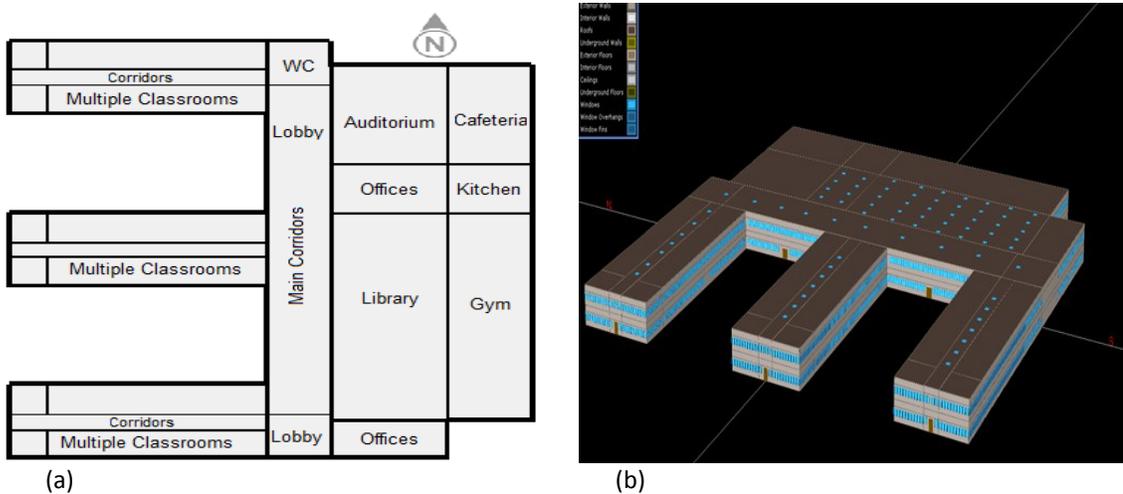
(a) Prototype model floor plan with zones, (b) 3D model Rendering
